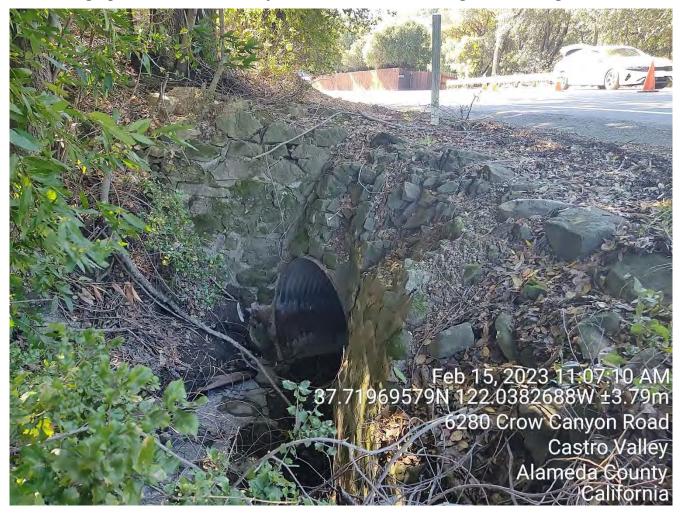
Slope Below Boring A-23-007 Location, Looking South
